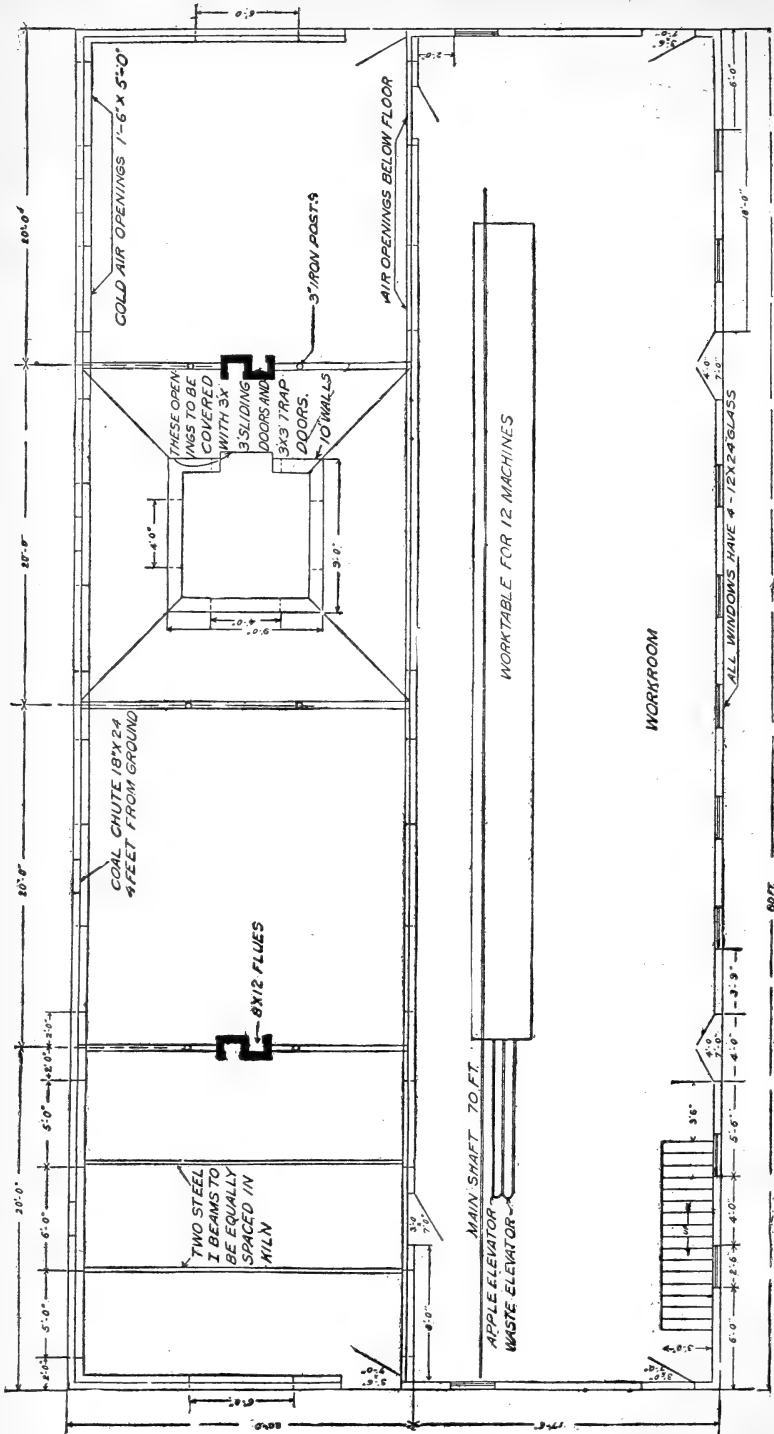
Ground-floor plan of a 4-kiln evaporating plant. The workroom provides ample space for an office and for lockers for the use of employees, as well as room for storing sufficient fruit for a day's run.
